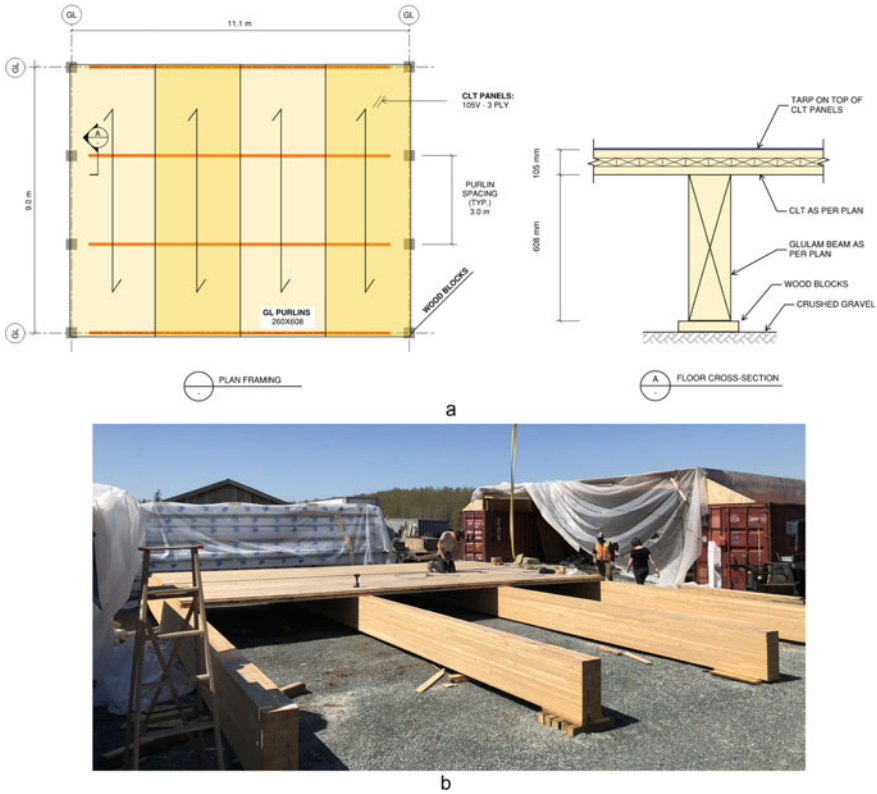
Overview of a mock-up geometry, and b the mock-up during construction
